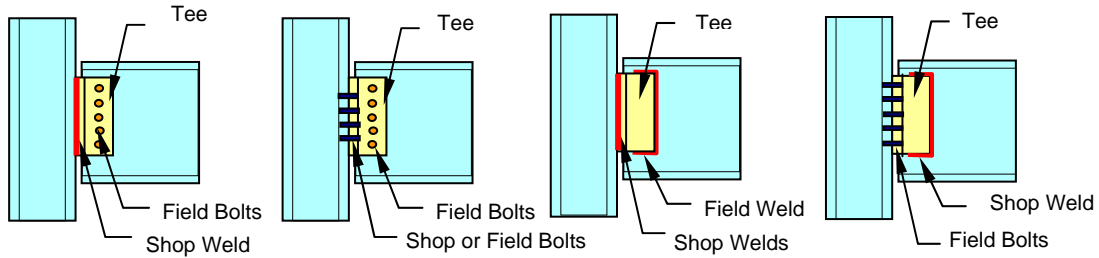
Use of Bolts and Welds in Tee Shear Connections
